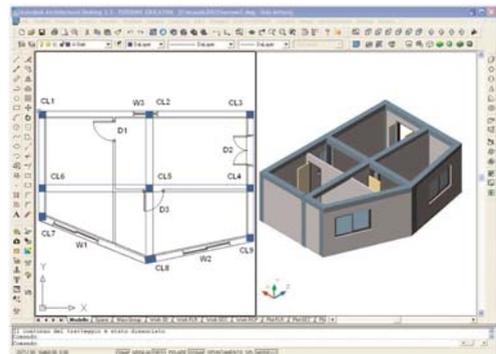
A structural plan superimposed to the architectural plan, an hard (CL2|W3) and a soft (CL5|D3) constraints are detected.
